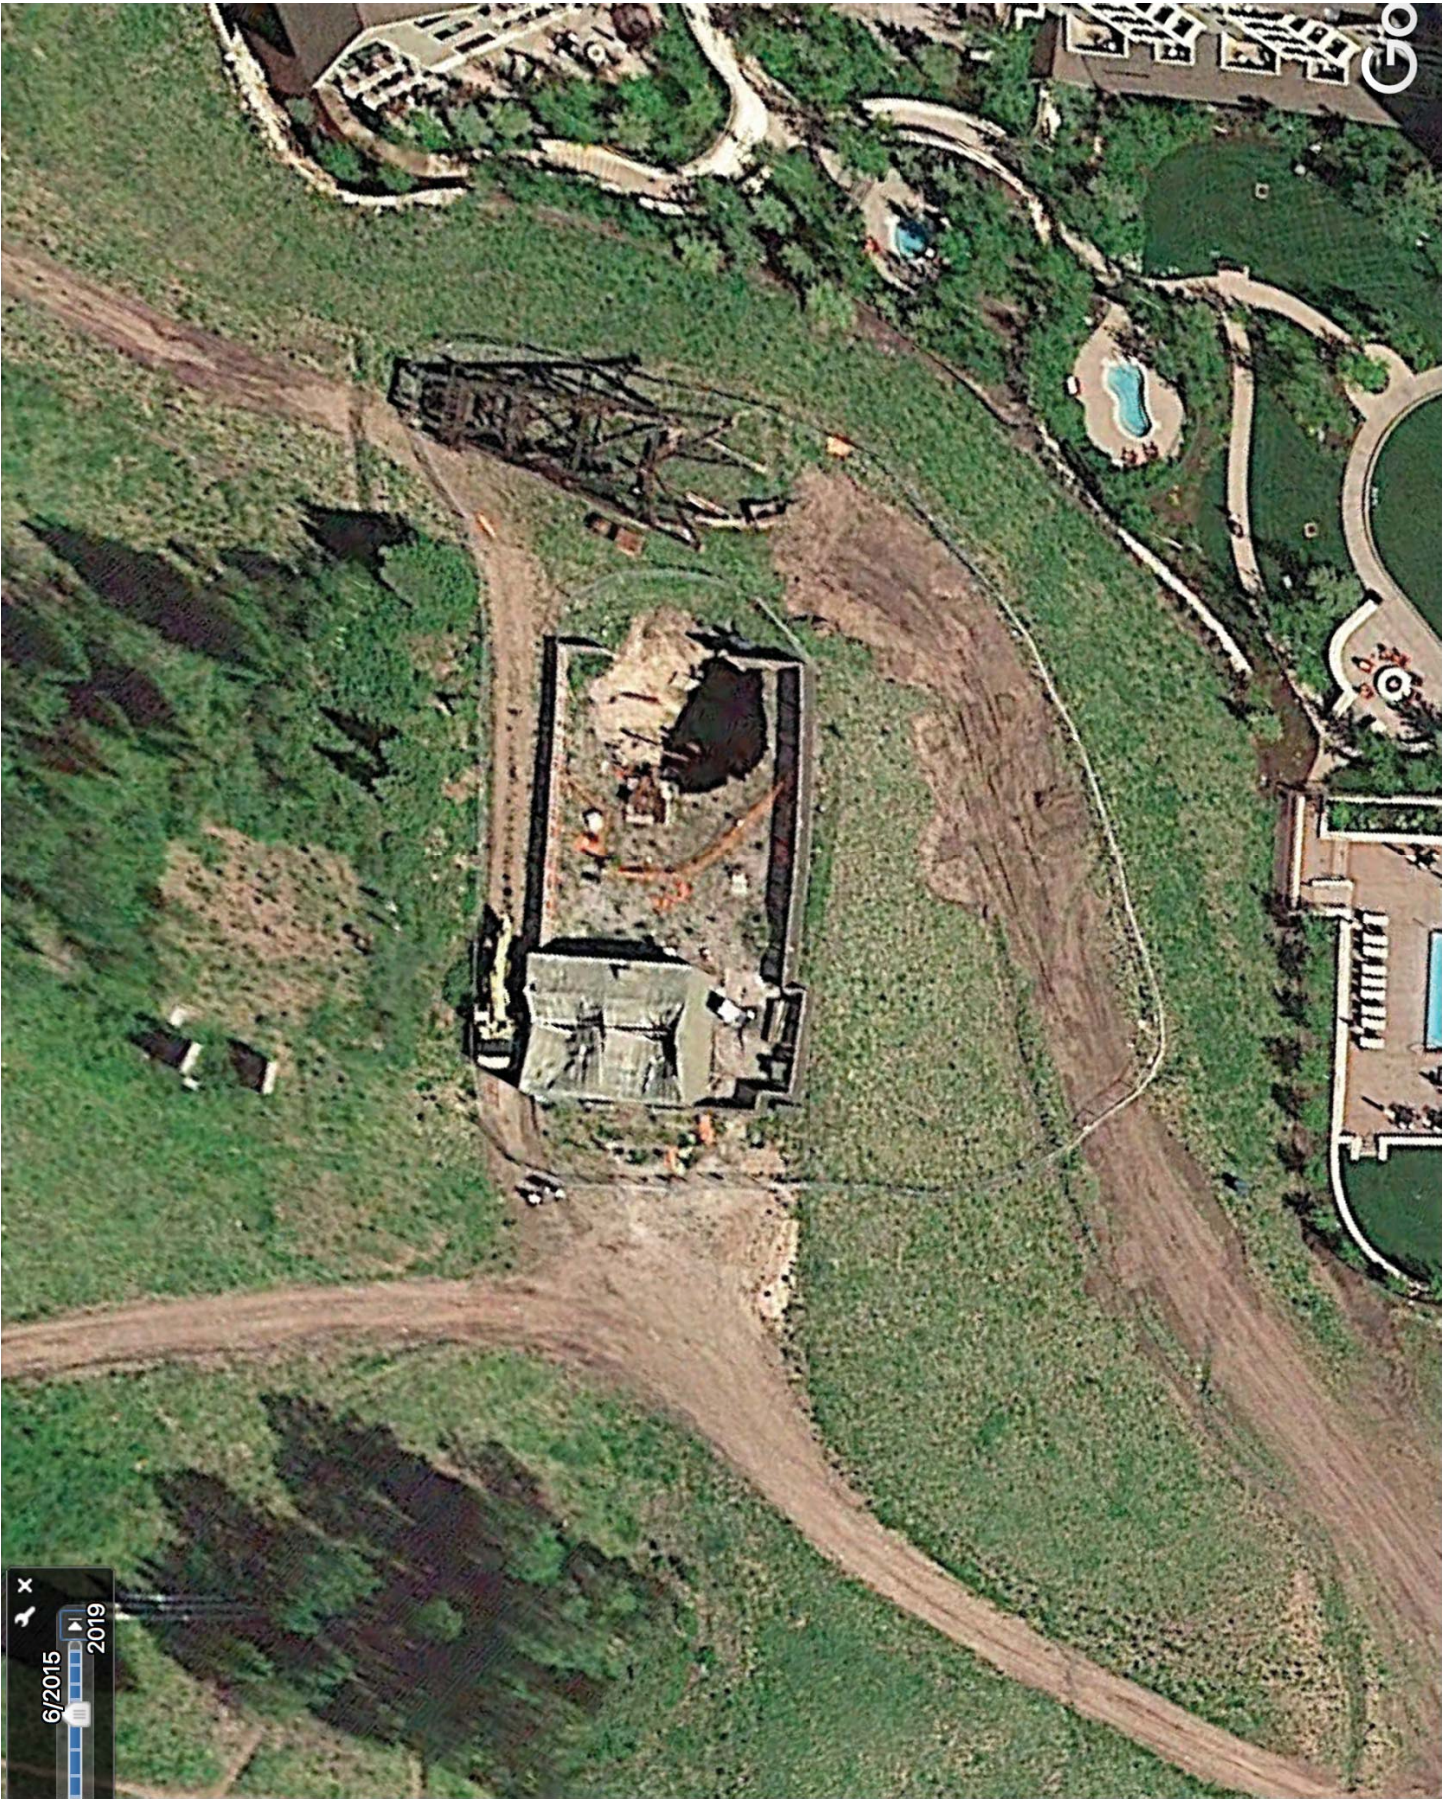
Overview of collapsed Daly-West Mine Headframe, facing southeast.
